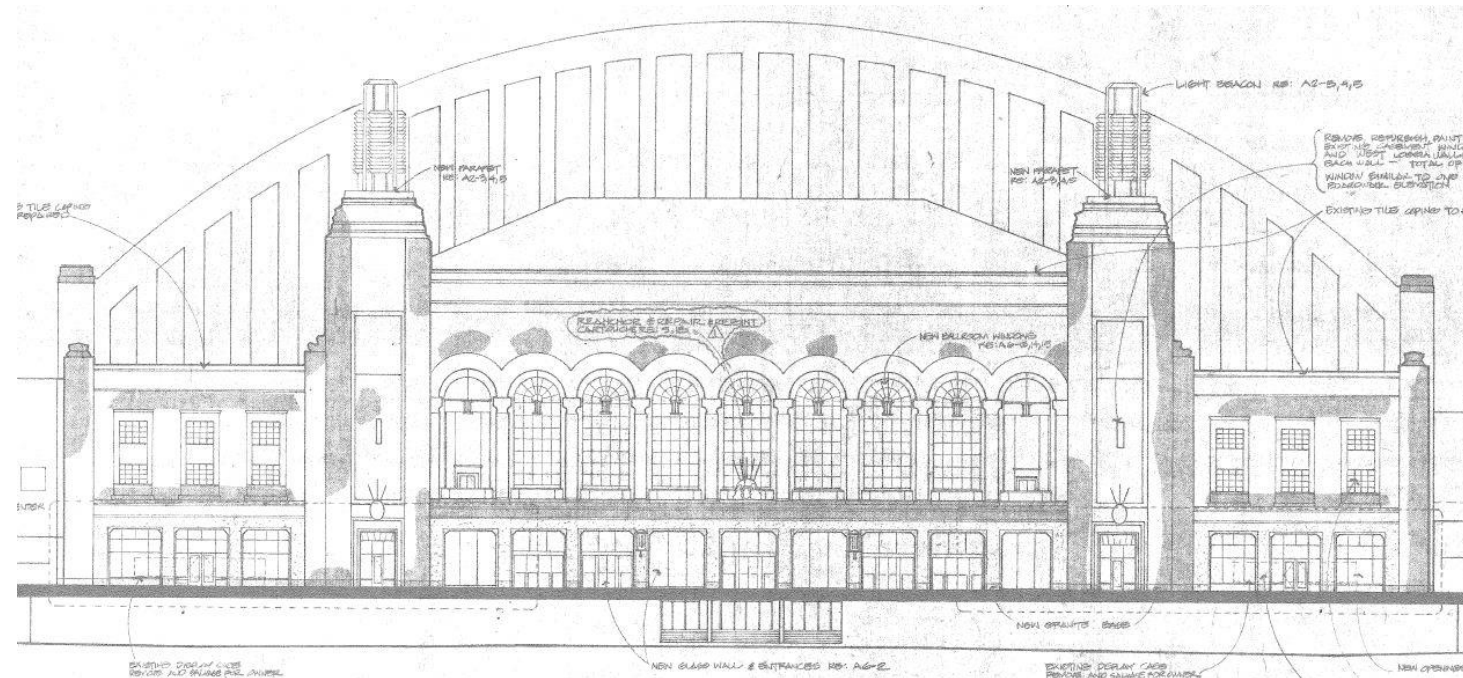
A: BOARDWALK ELEVATION – NTS (PROVIDED BY PFA)
